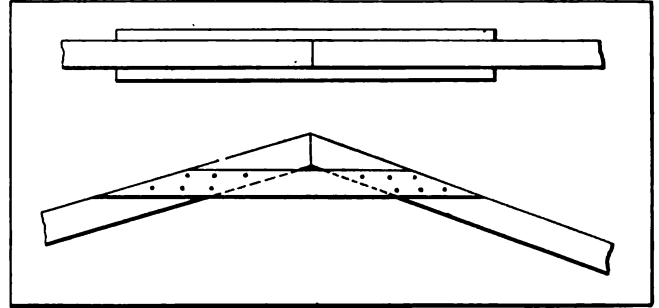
Roof framing; a simple plan; as strong as it is easy to make
